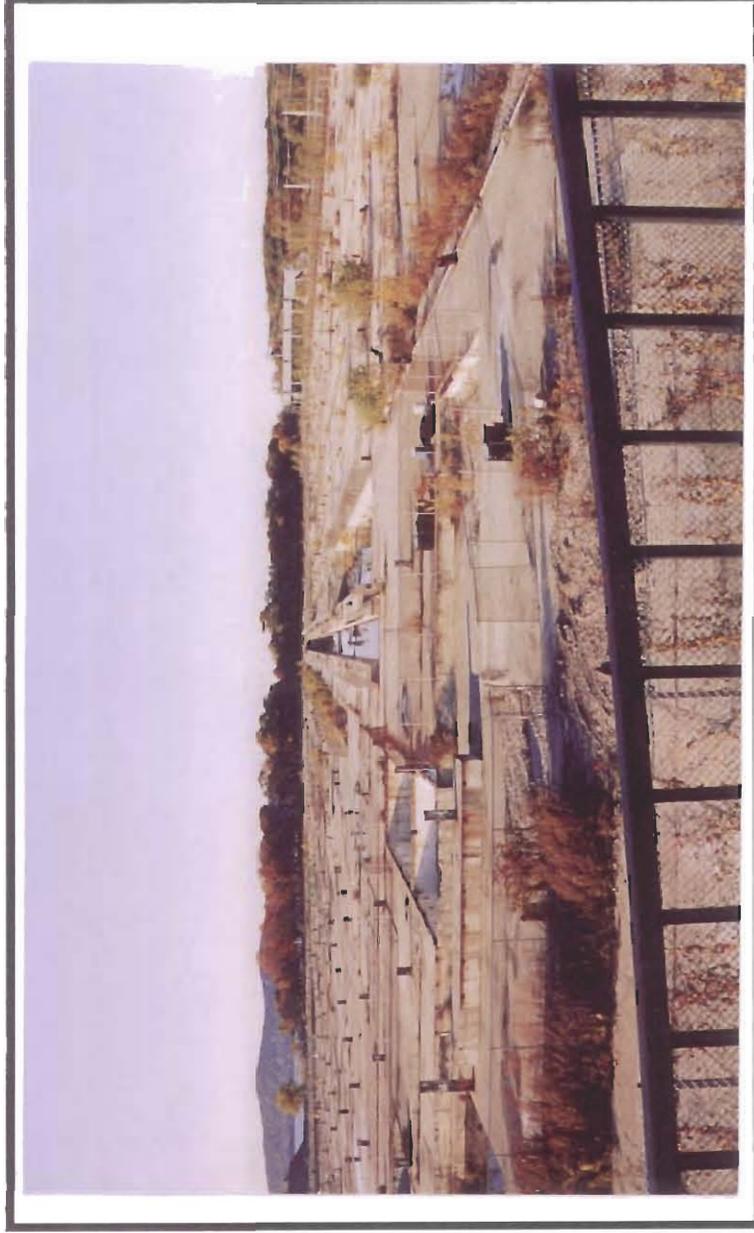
View north across site from Beekman Avenue. Large areas of the site were formerly occupied by Chevrolet Motors Company Plant No. 2. Building was 1-story. When plant was demolished, the beams supporting the roof were cut off, leaving ground floors and basements. Kingsland Point Park is in background.
